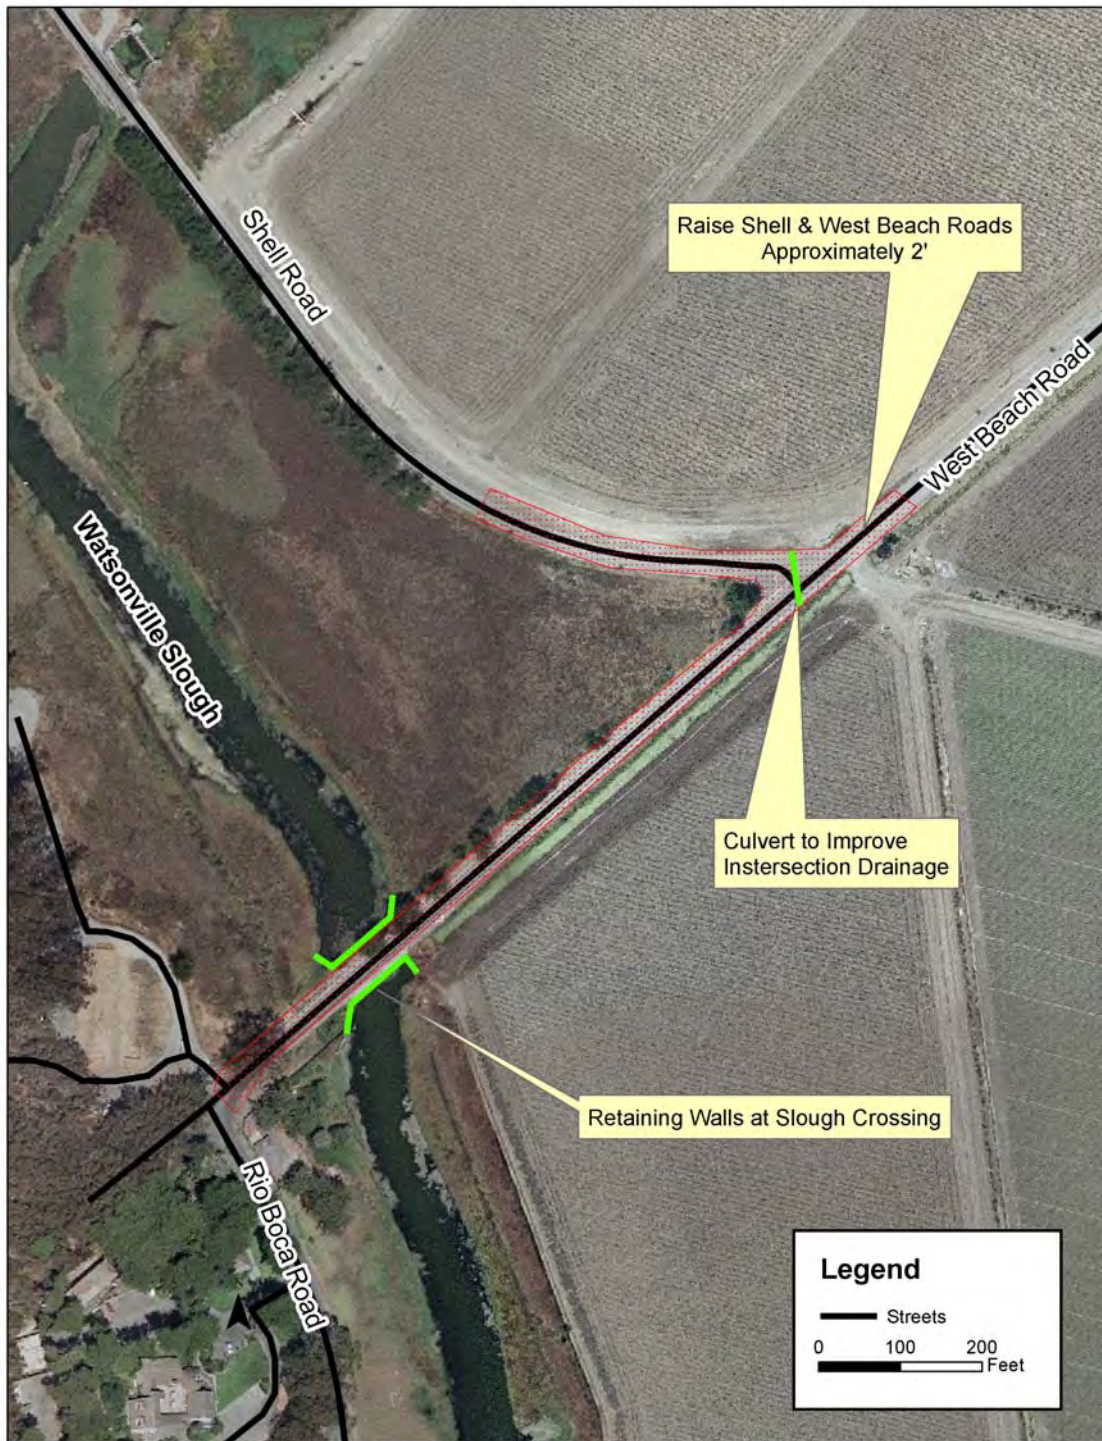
Alternative 2 -- Elevate Shell and Beach Roads
